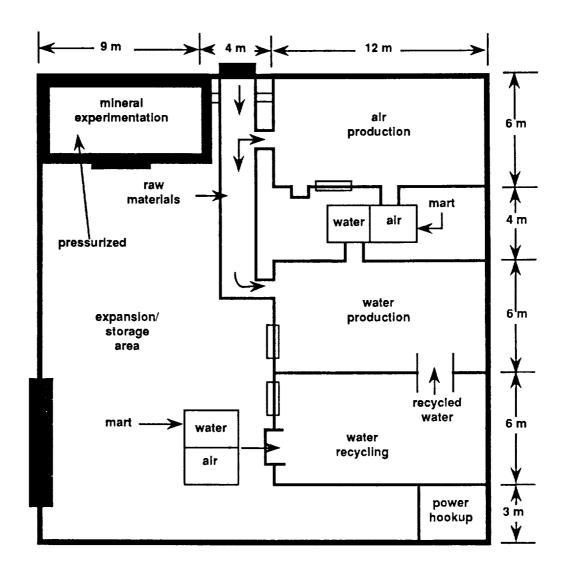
MANUFACTURING FACILITY LAYOUT
